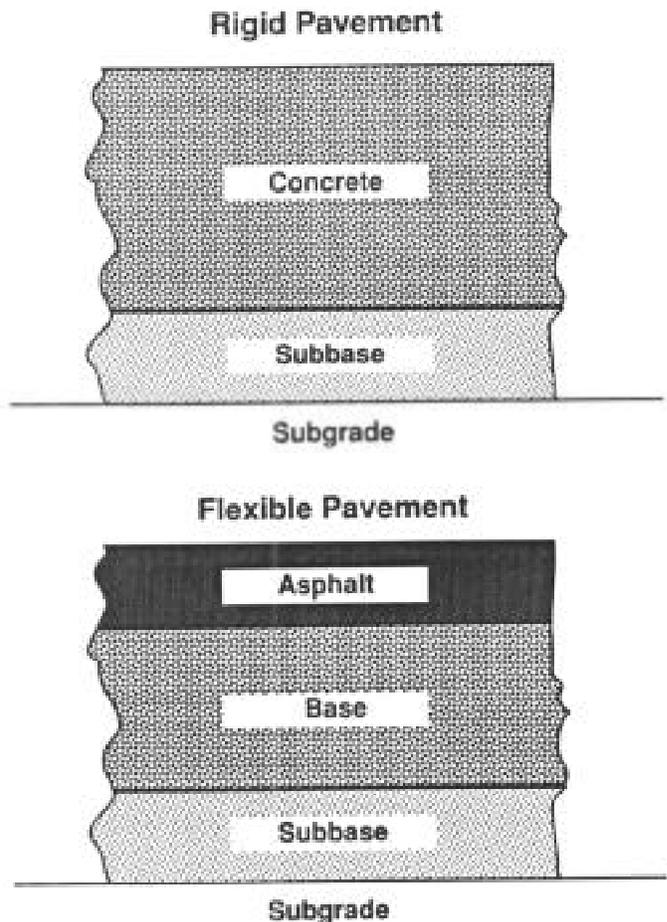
Terminology Used in Rigid and Flexible Pavement Layered Systems
